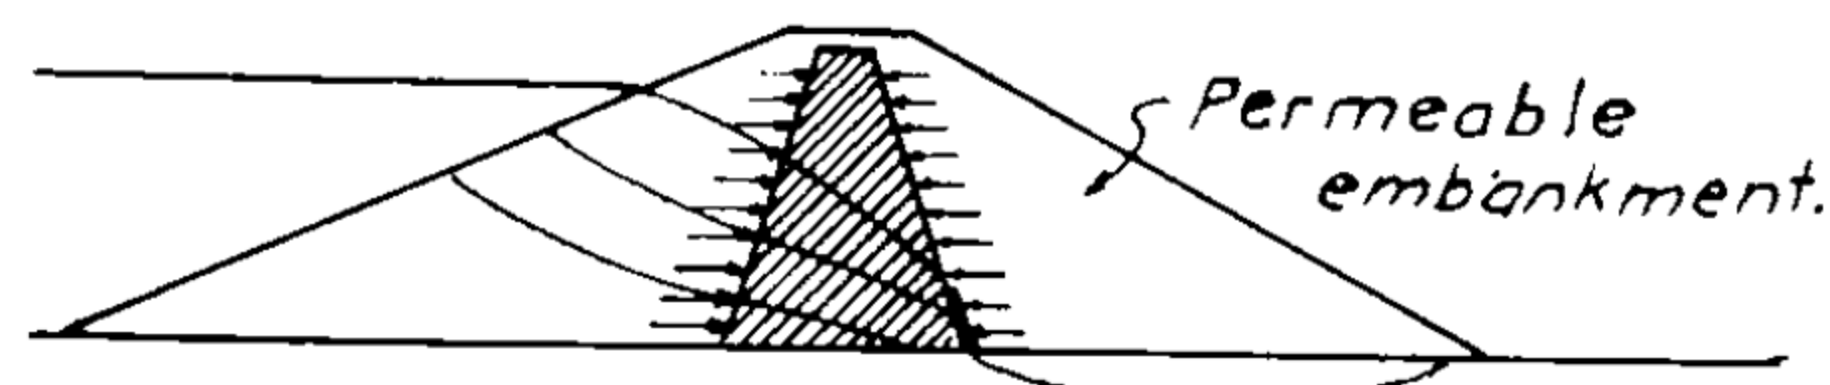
FIG. G- SHOWING HOW CORE WALL IS SUPPORTED BY ADJACENT SLOPES.
